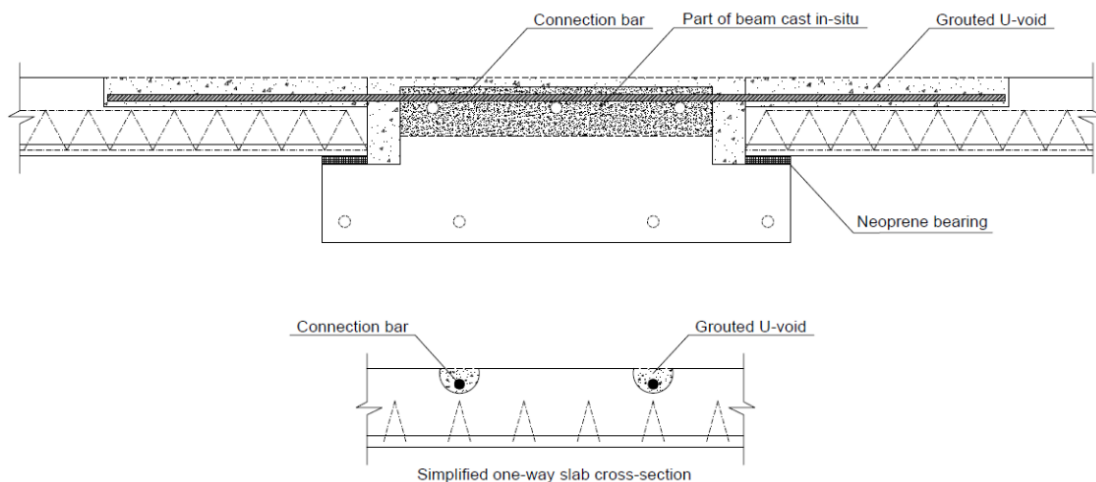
Cross sections of proposed connection for in-situ floor slabs. (Volkov, 2019)
